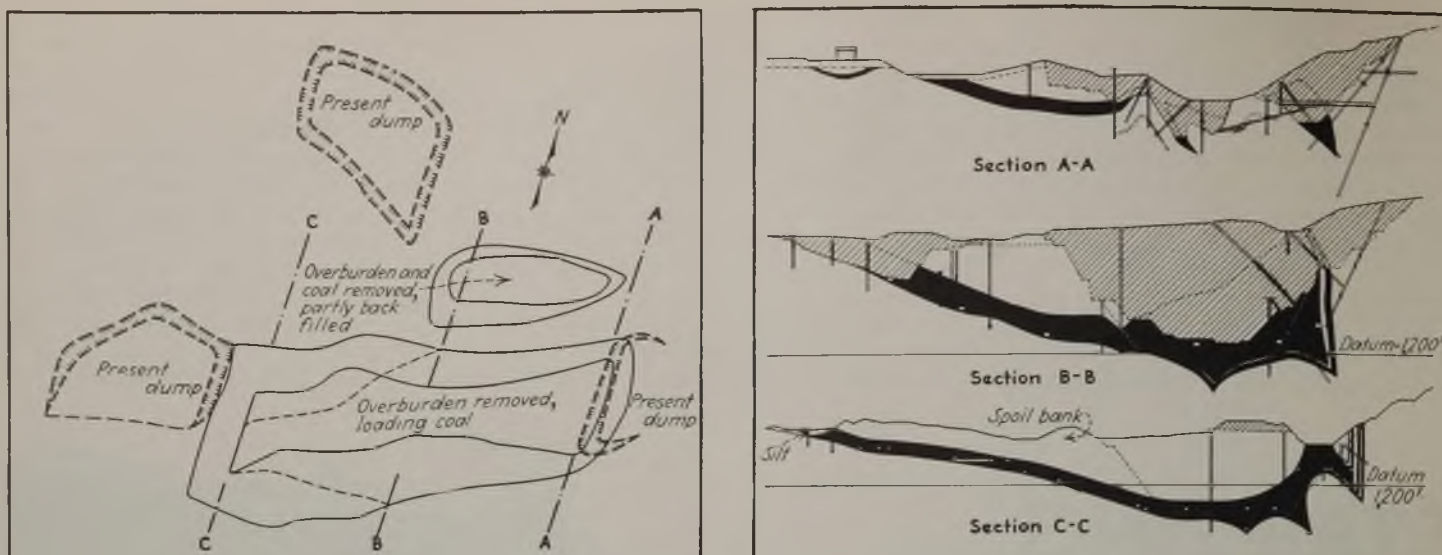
Plan and sections of Summit Hill stripping, showing present dumps and progress of excavation
